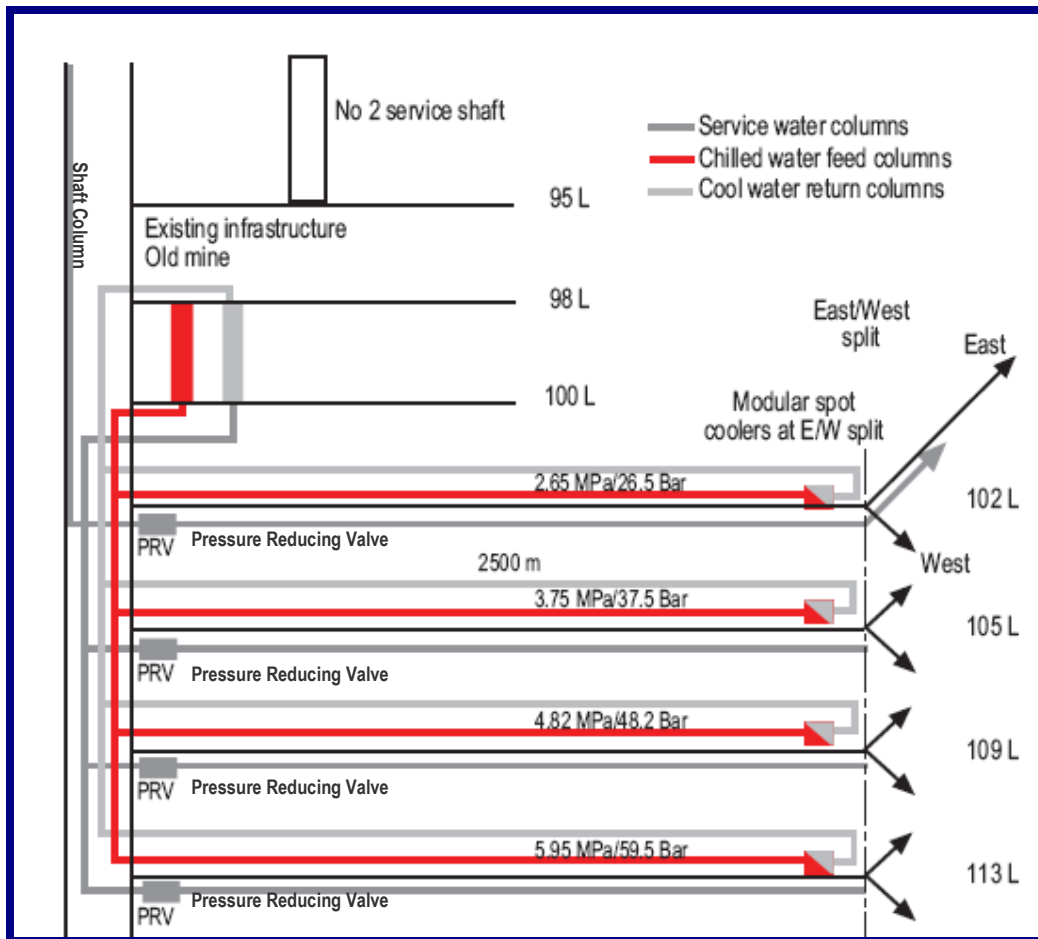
Mine water layout of the “New Mine” at Elandsrand
